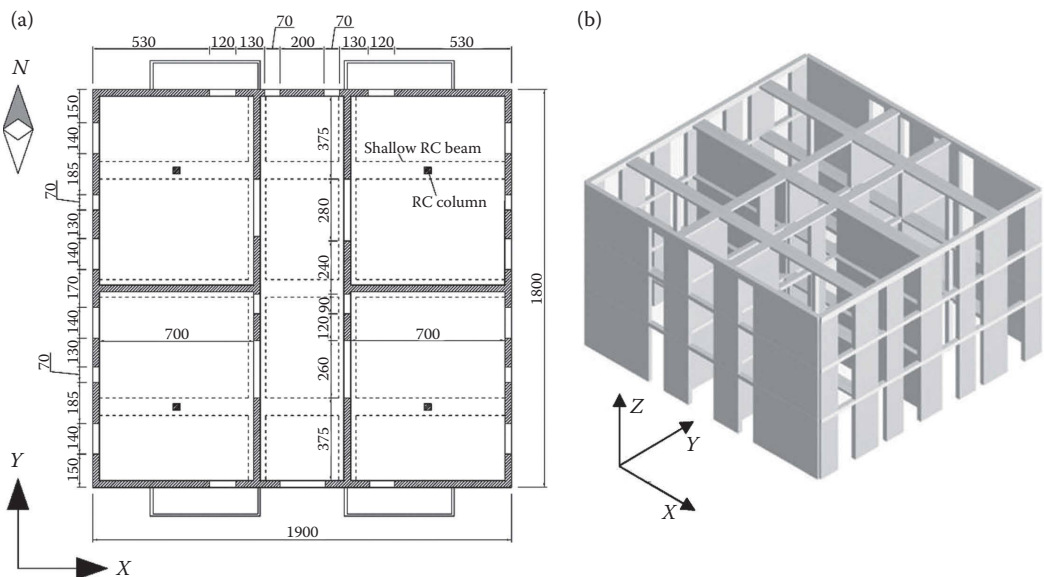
Plan (a) and 3-D view (b) of the design example masonry building (dimensions in cm).
